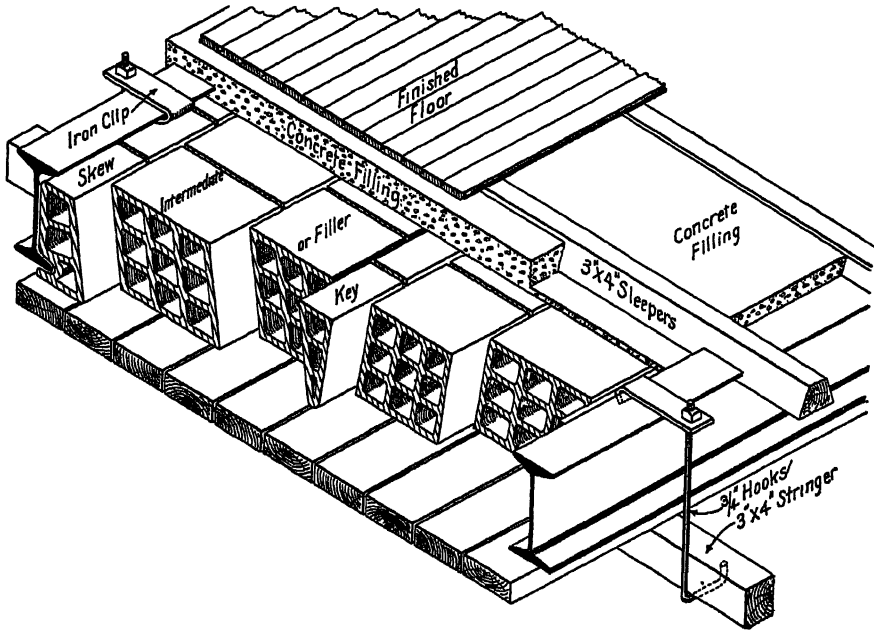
FLAT FLOOR ARCH (SIDE-METHOD CONSTRUCTION).
